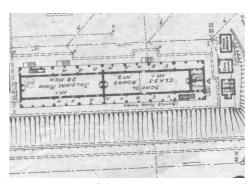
1926 G/F Plan, extracted from the 1926 Whitfield Barracks Skeleton Record Plan, sheet 1/2 (Source: PRO HKRS913-1)
